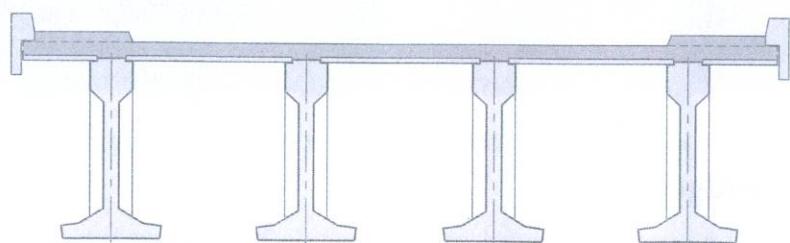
Cross section of a beam bridge with inverted T-beams
